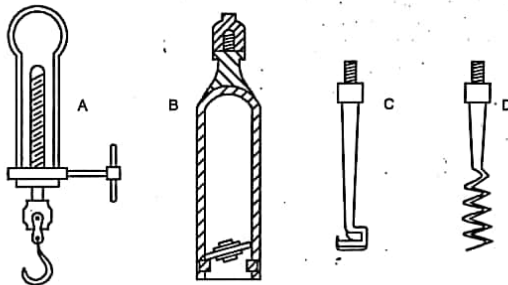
(A) Stirrup and screw. (B) Sludger (C) Crow's foot (D) Sprial worm
